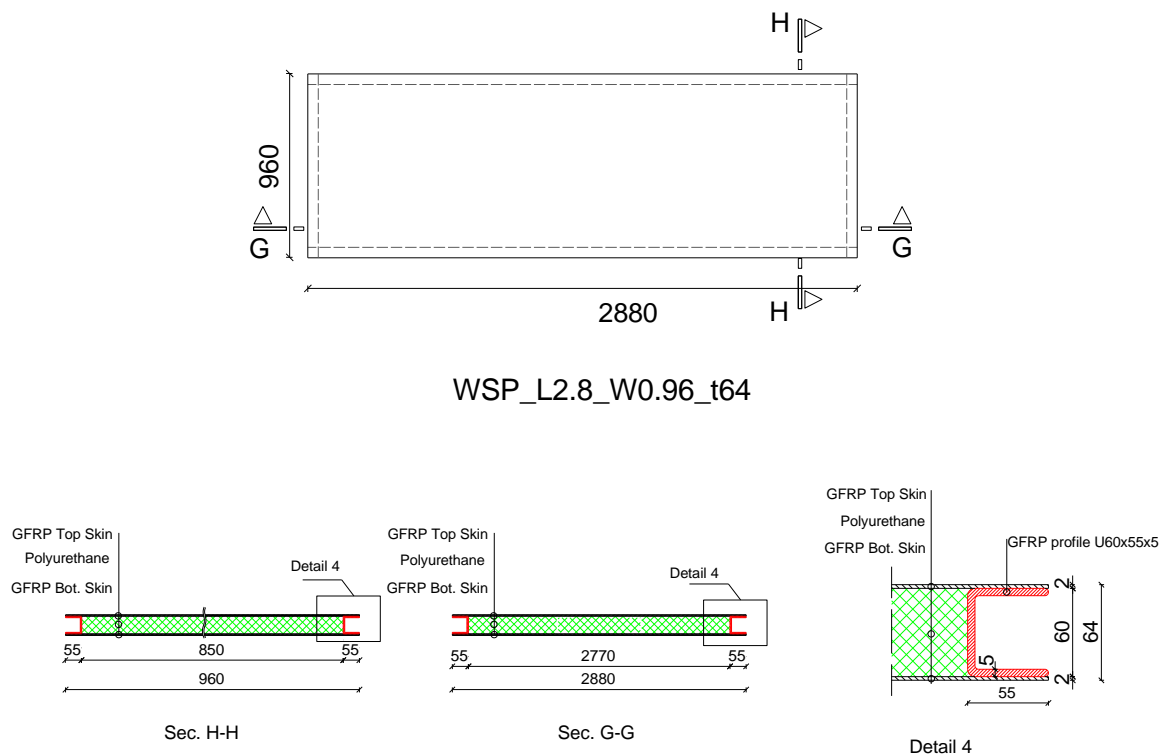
Geometry of the wall sandwich panels (all units in millimeters)
